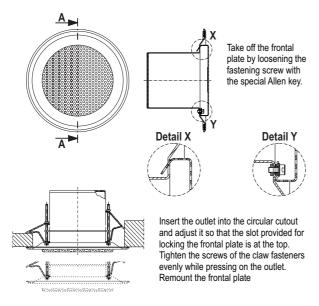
Mounting sketch for circular step displacement outlet, showing DN 80 (Similar mounting for DN 100)
